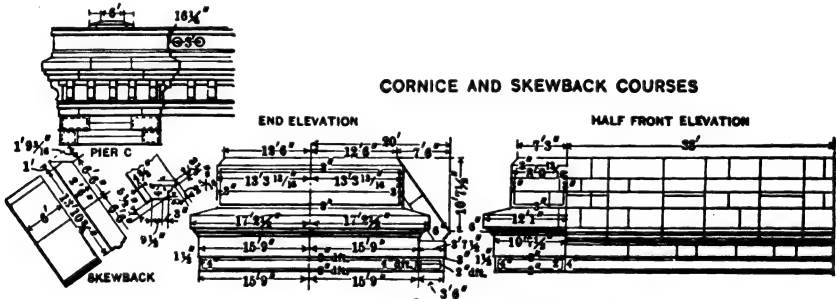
DETAILS WASHINGTON BRIDGE PIERS.
